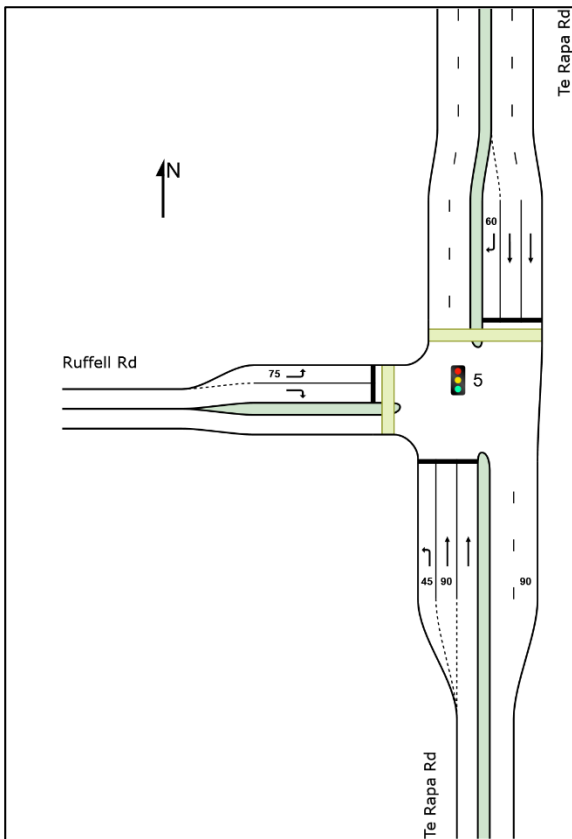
Proposed Te Rapa Rd / Ruffell Road Signalised Intersection Layout
